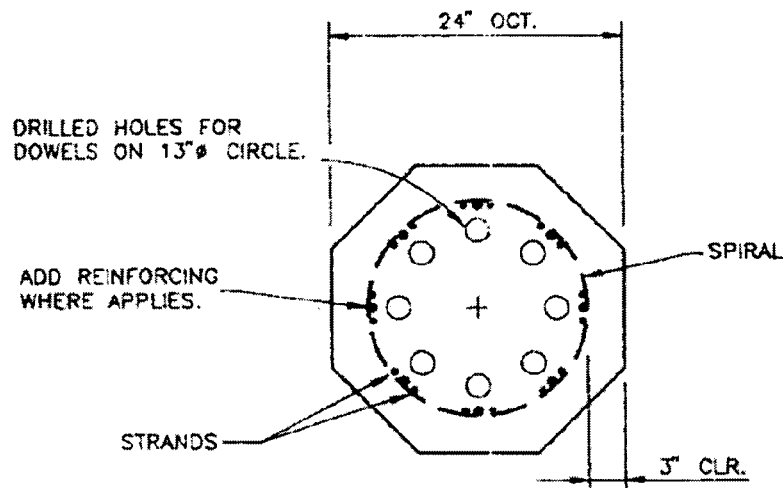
Typical Pile Section from Port of Oakland Wharf, Berth 68
